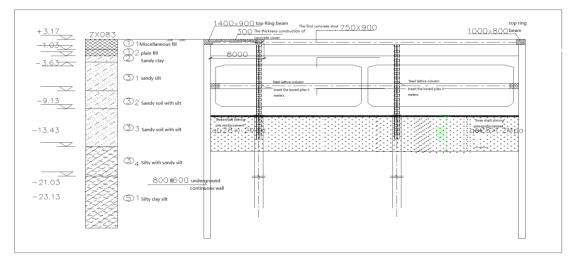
Rainbow Road (mind of city road ~ workers road) section A geological profile
